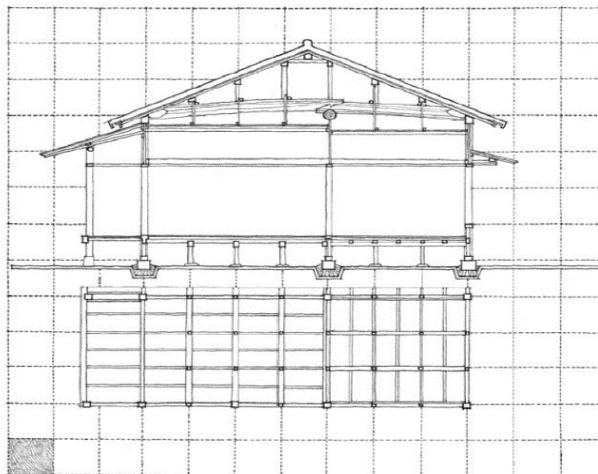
Design of a traditional Japanese house with ken method (Source: Ching, F. DK, 2007)
